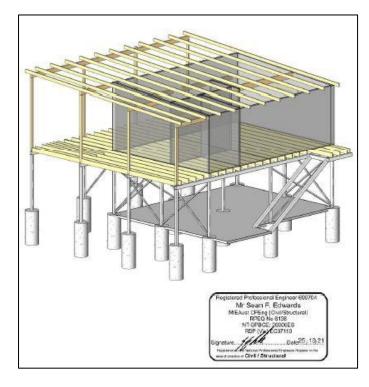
Proposed Secondary Dwelling. (TMI Consulting Drawing S01)
